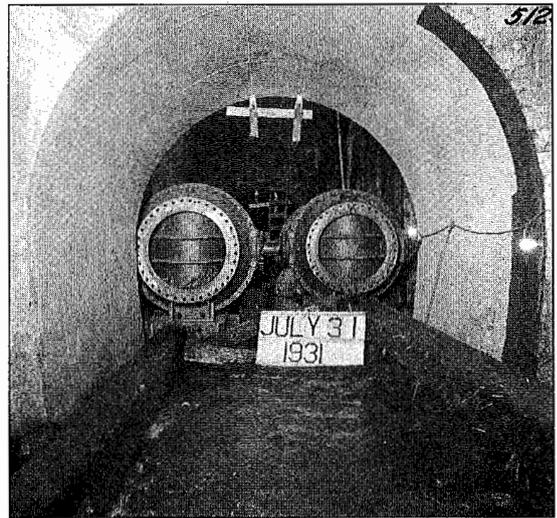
A view downstream in the diversion tunnel showing the rotary valves installed in the gate chamber.
